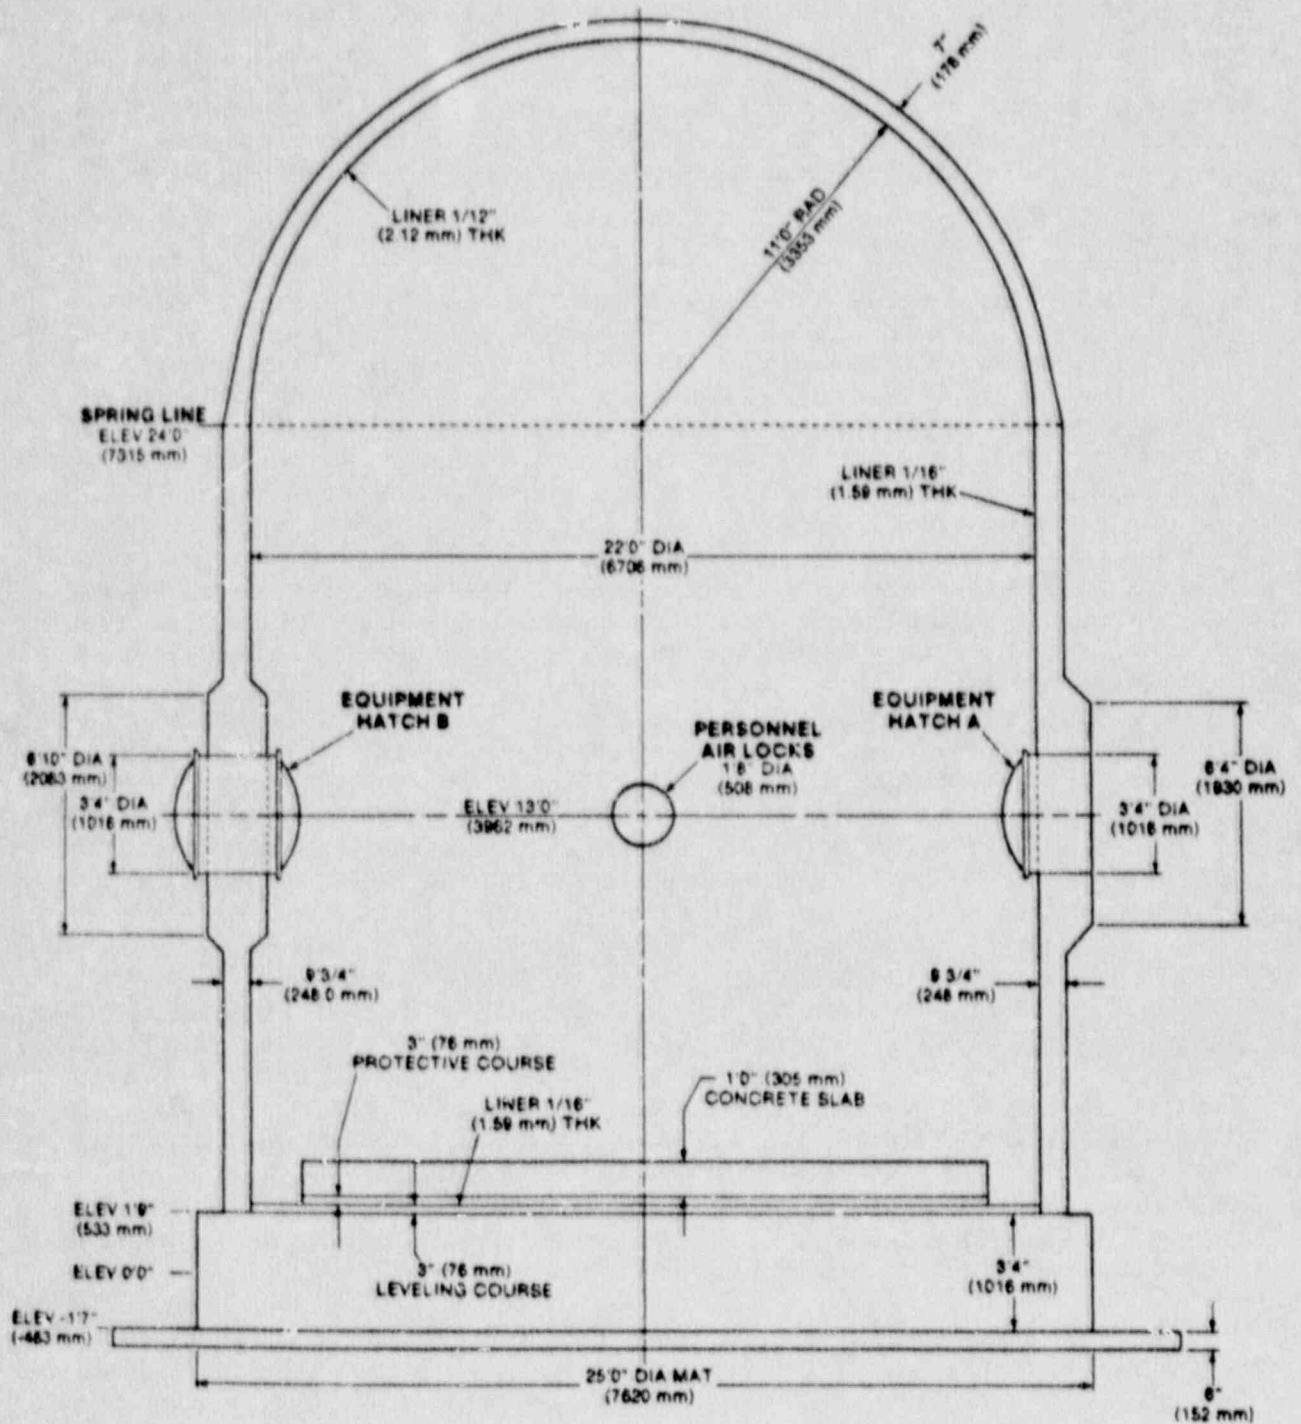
Schematic of 1:6-Scale Reinforced Concrete Containment Model
